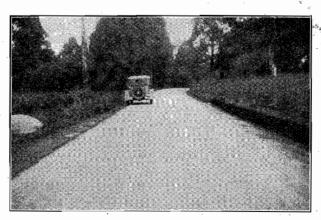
Gravelled Section, Tolmie-Whitfield Road.
